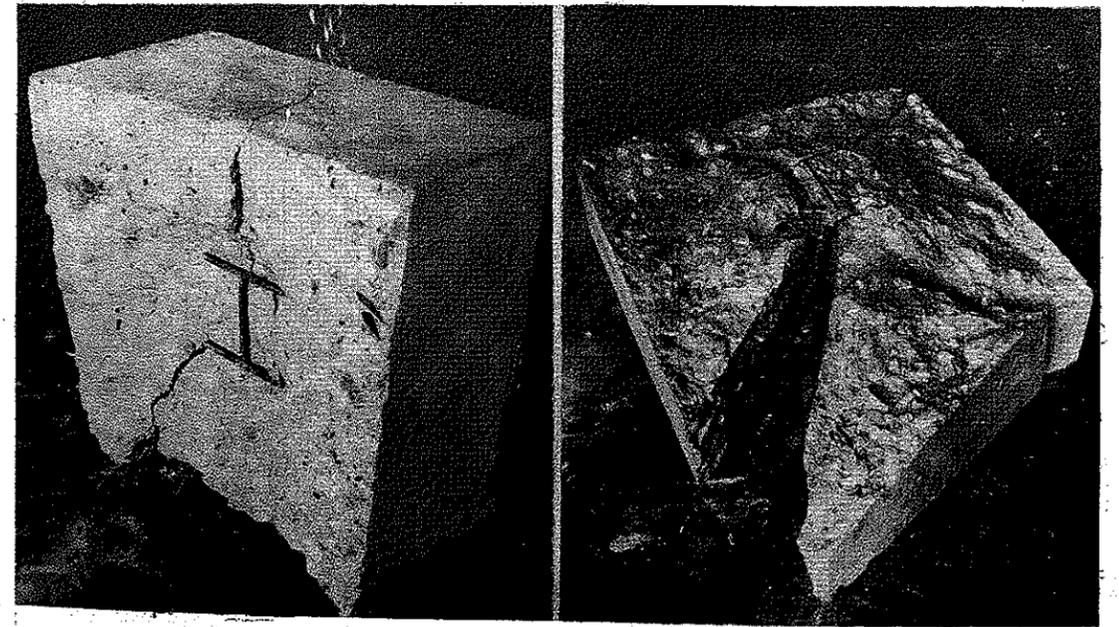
APPEARANCE OF SPECIMEN B-3 AFTER TESTING.
